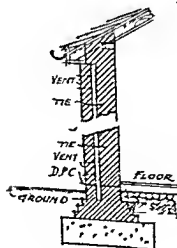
Section of hollow brick wall with ventilation of cavity by grating
